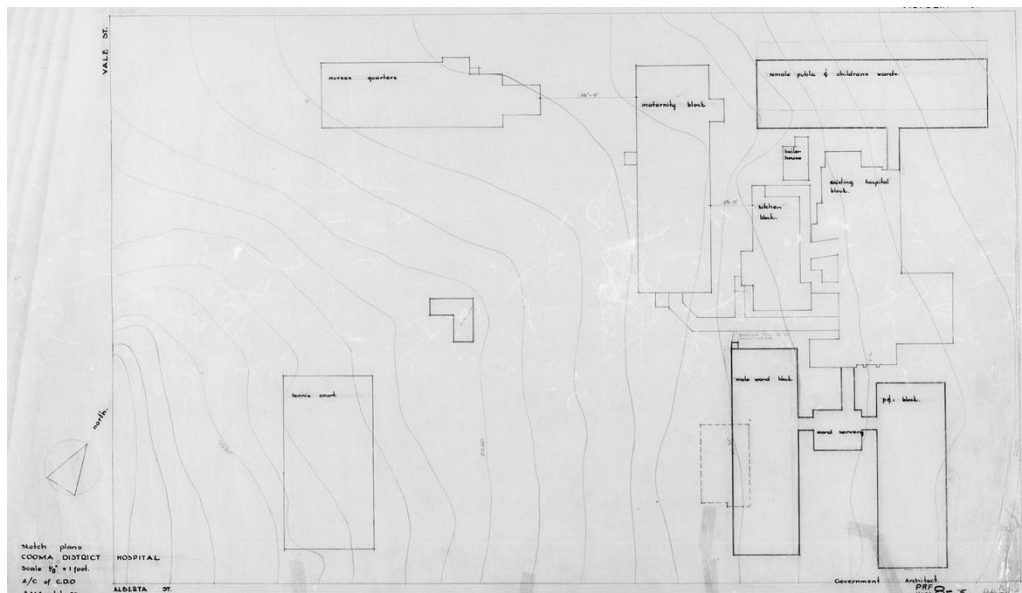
Sketch site plan for the Cooma Hospital, dated July 1950, showing the layout of existing and proposed new buildings at the hospital site (Source: NSW Plan Services (PWA), PRF-PH8-3, Cooma Hospital – Site plan)
